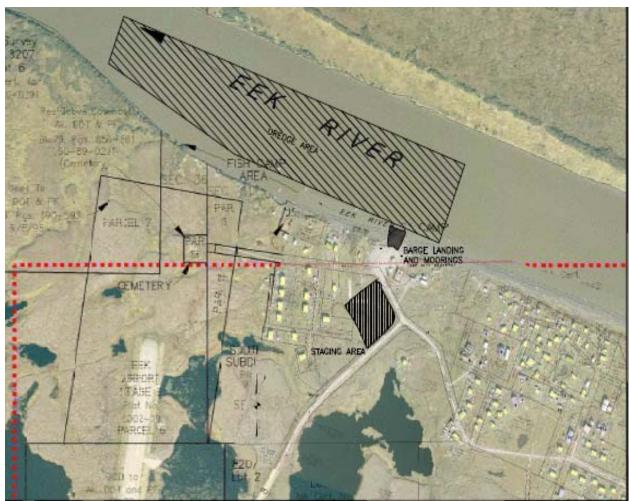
Plan view of proposed barge landing, area to be dredged, and staging area
